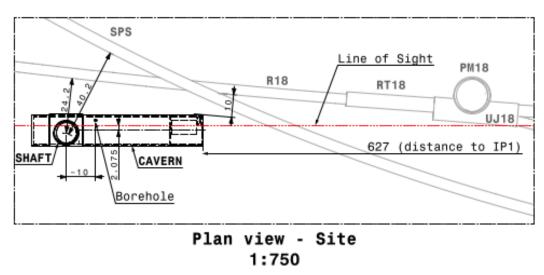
Situation plan of the underground facility with the proposed safety corridor inside the cavern
